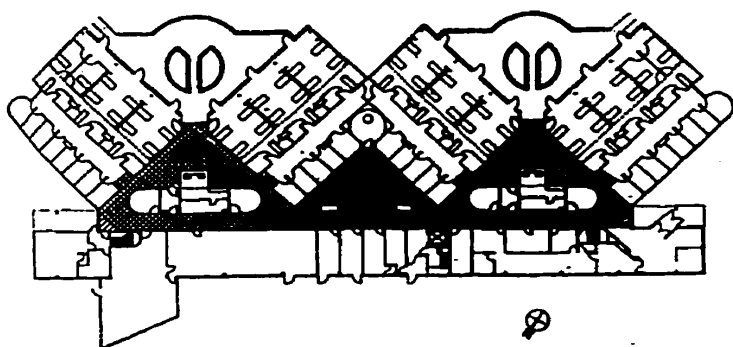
B: Floor Plan, Connecticut Hospice (Chan, p.44)
